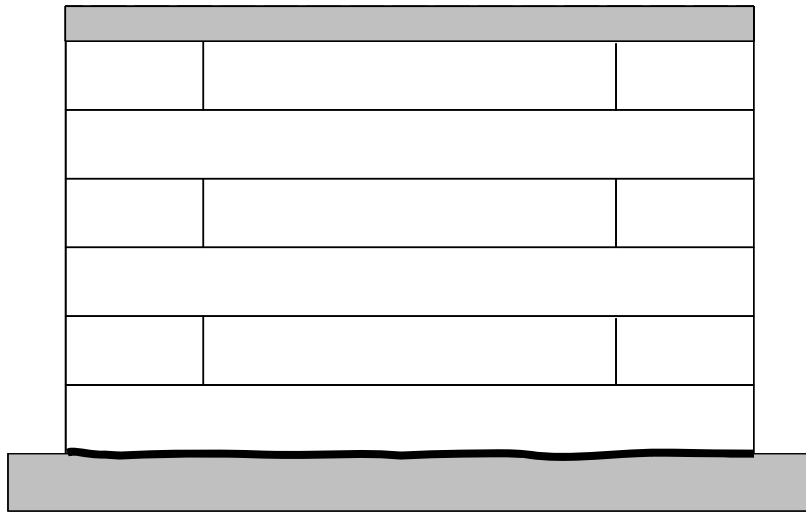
Initial shrinkage crack at base of Shear Wall Pilot Specimen 2
